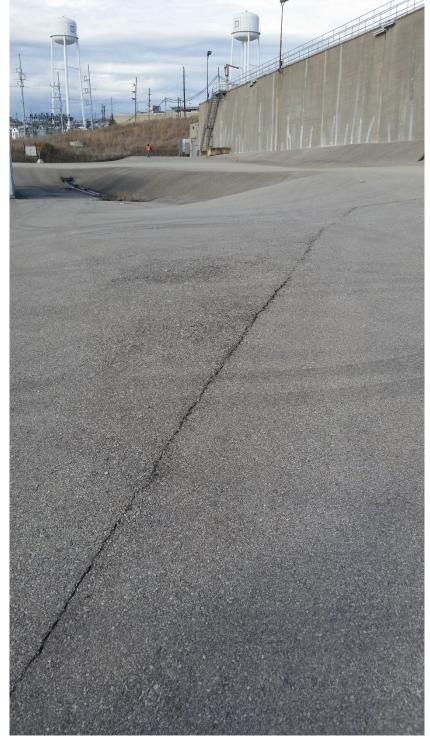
EA2 facing west, cracks in asphalt west of Parcel 205.
